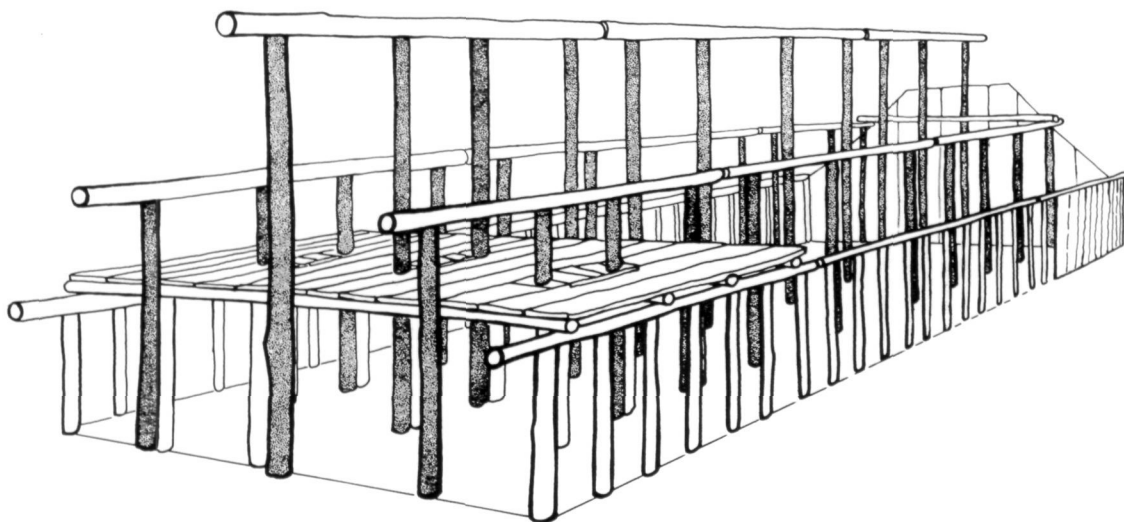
Reconstructed internal structure of a Bandkeramik longhouse (Type 1) with storage floor in the south-east section
